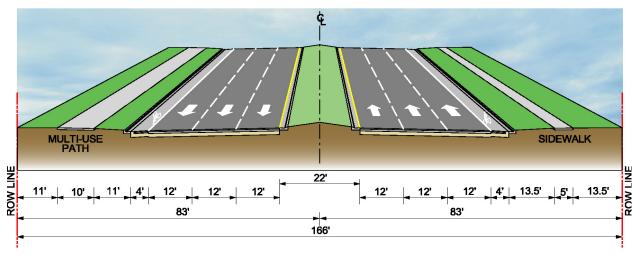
SIX-LANE DIVIDED URBAN TYPICAL SECTION THROUGH PROMENADE TOWN CENTER
